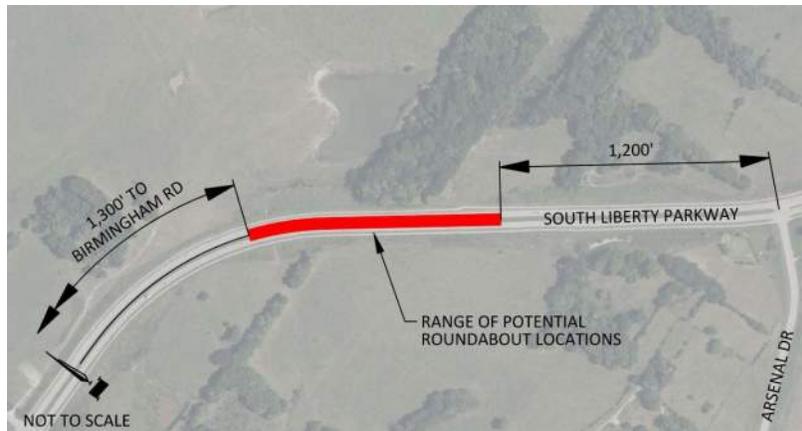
Potential Roundabout Locations In Central Portion of Corridor
